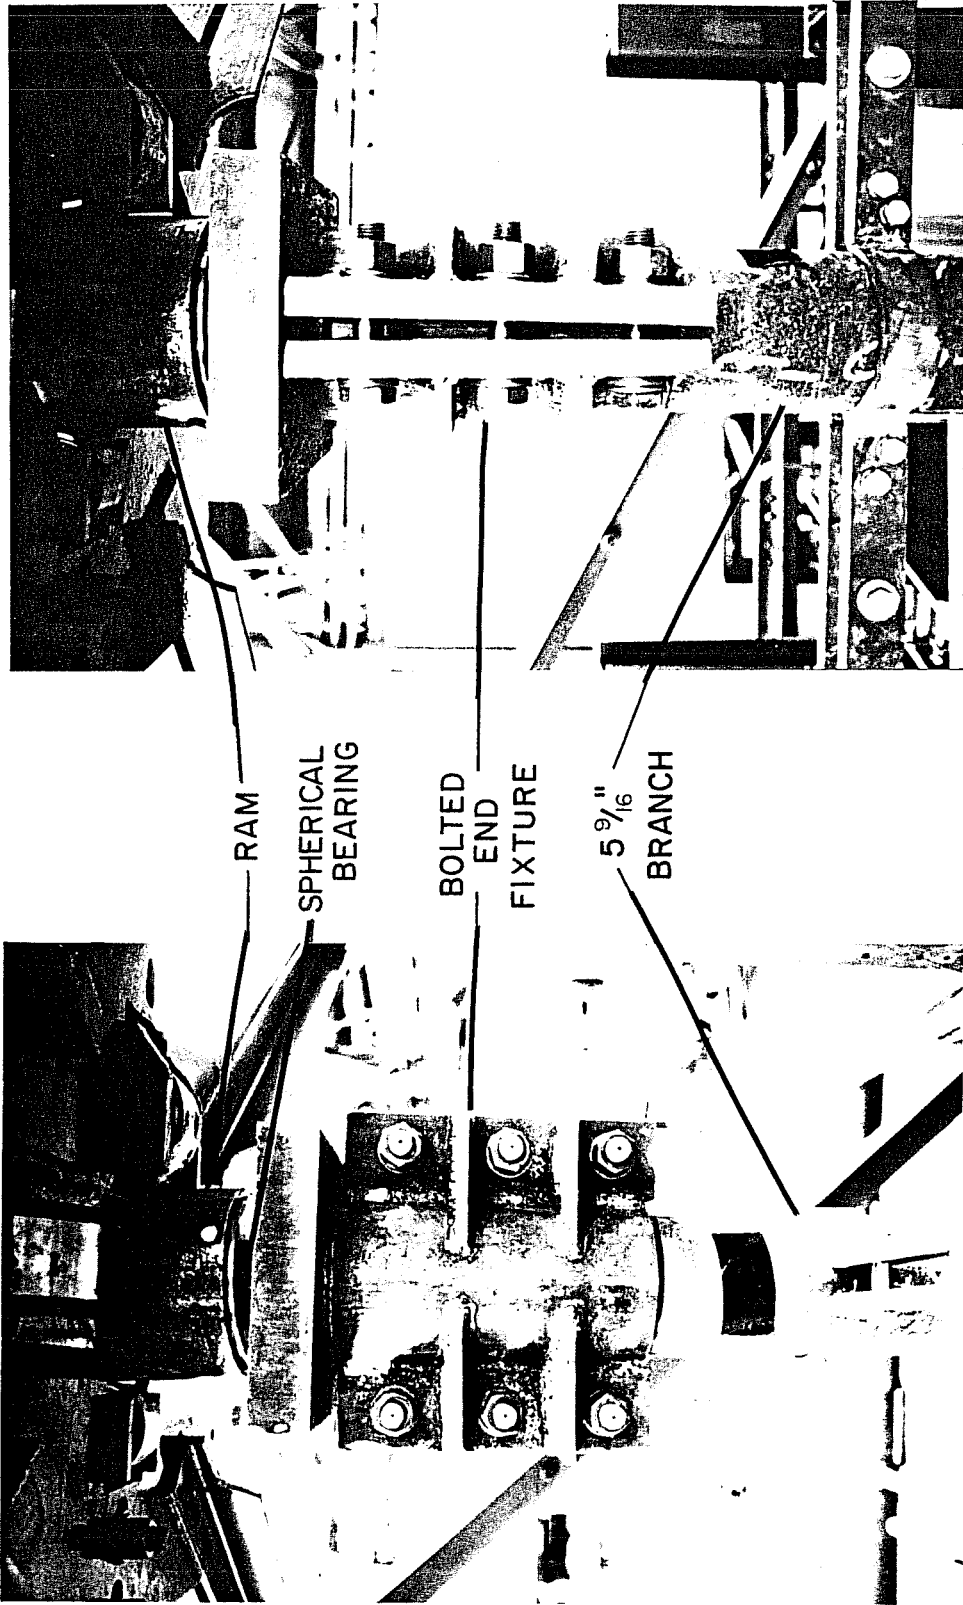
Axial End Fixture for ≈ 0.35 joints
